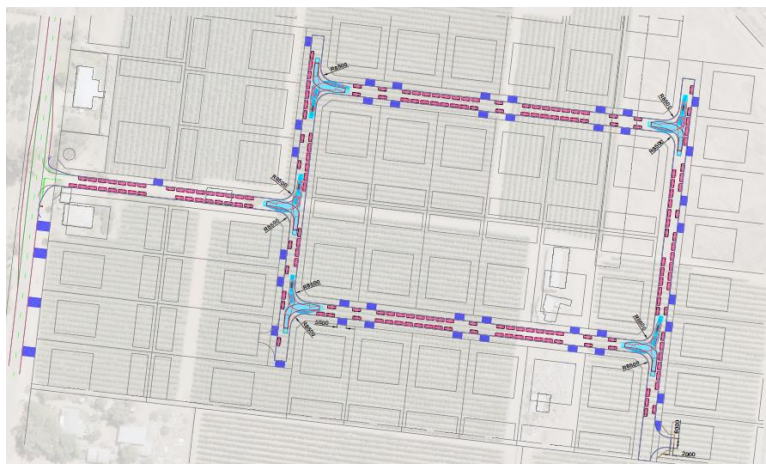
Indicative turn paths and on-street parking plan (part of Cirqa dwg 26042 Sheet#01_SH01)
